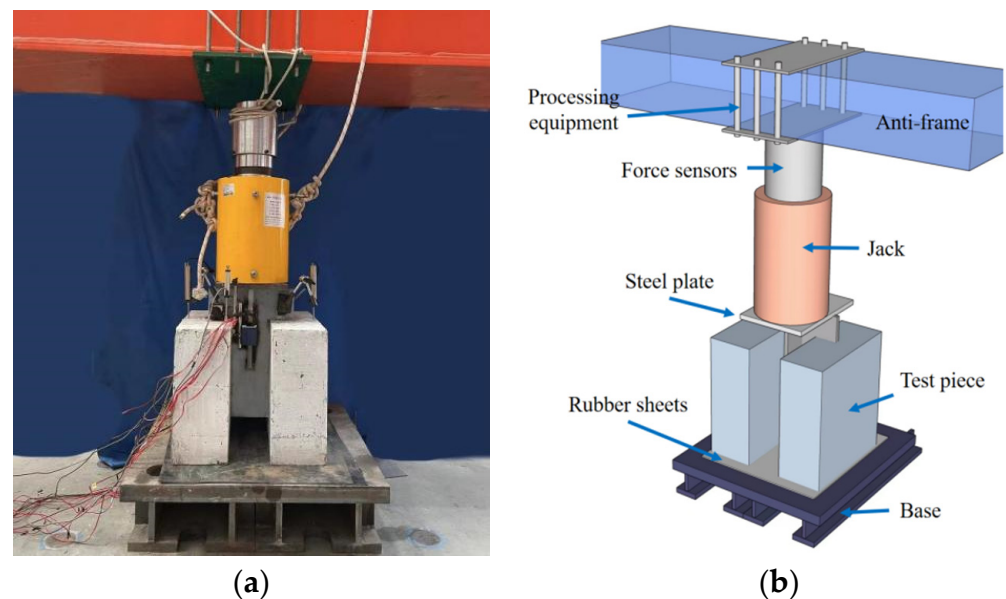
Specimen loading. (a) Specimen loading photograph; (b) specimen loading diagram.
